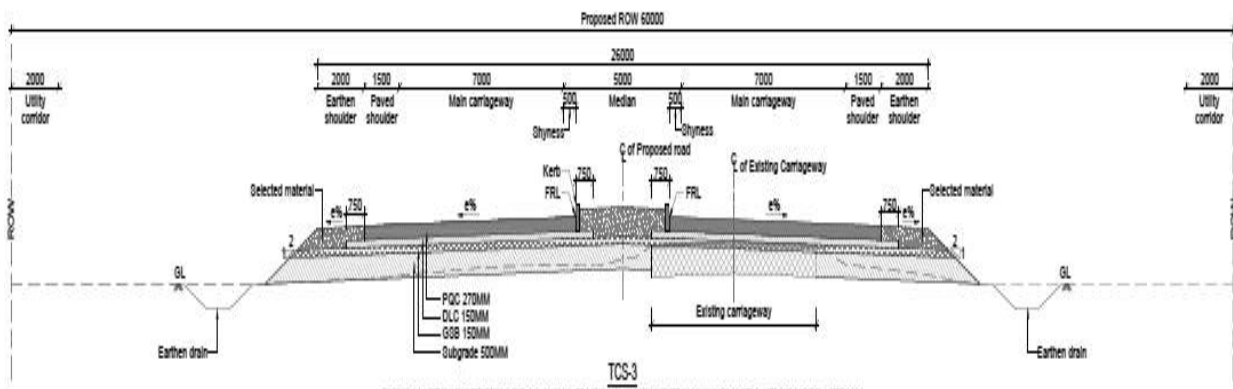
TCS-3 (Typical Cross Section Of 4-Laning By Eccentric Widening (LHS) With 4.0m Raised Median
